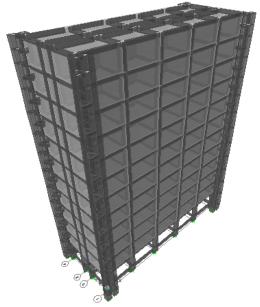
Building 3D view with Interconnecting Columns (ETABS Model)
